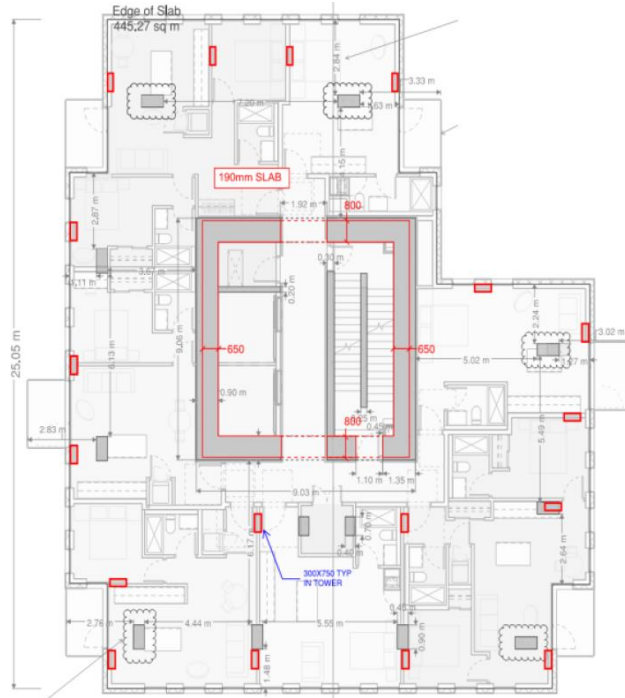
Preliminary Shearwall Layout for the Upper Floors of the Tower Option. Source: RJC Engineers Seismic Upgrade & Heritage Impact Assessment report, February 28, 2023.
